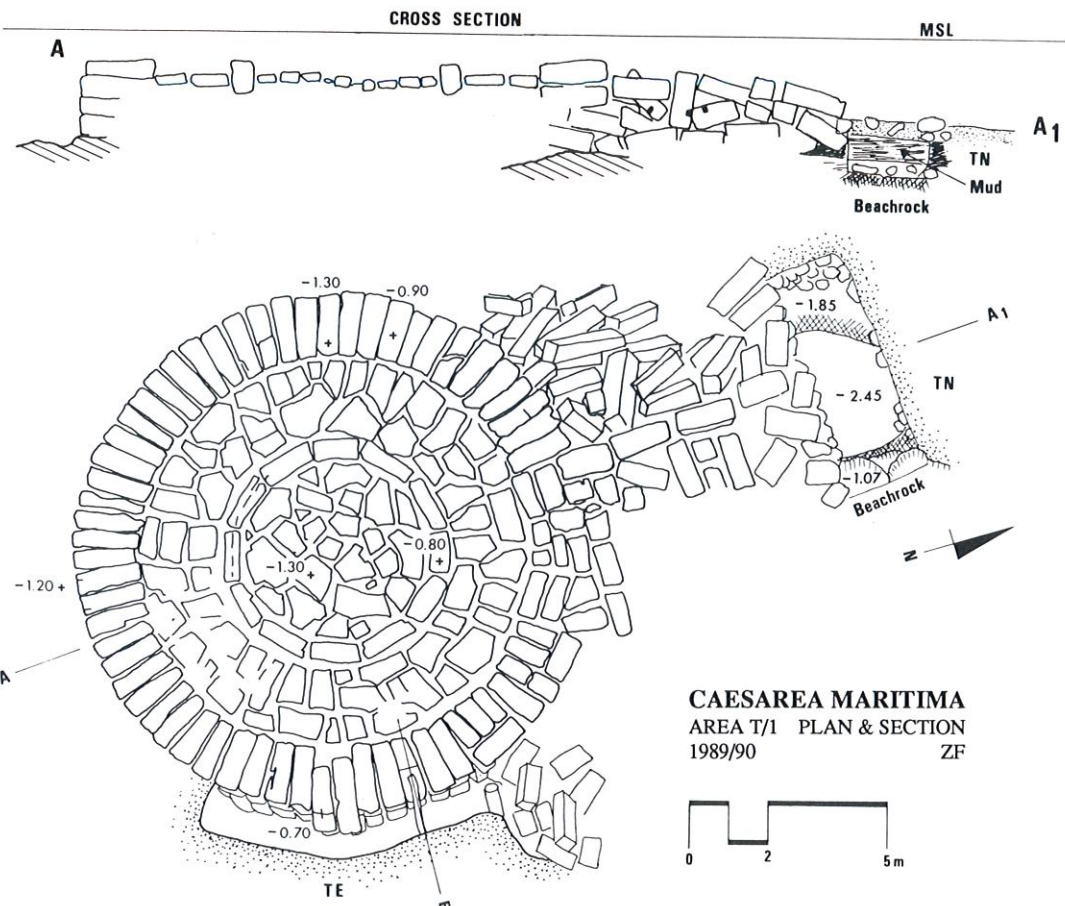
Area T/1 (with TE and TN), plan and N-S section.
